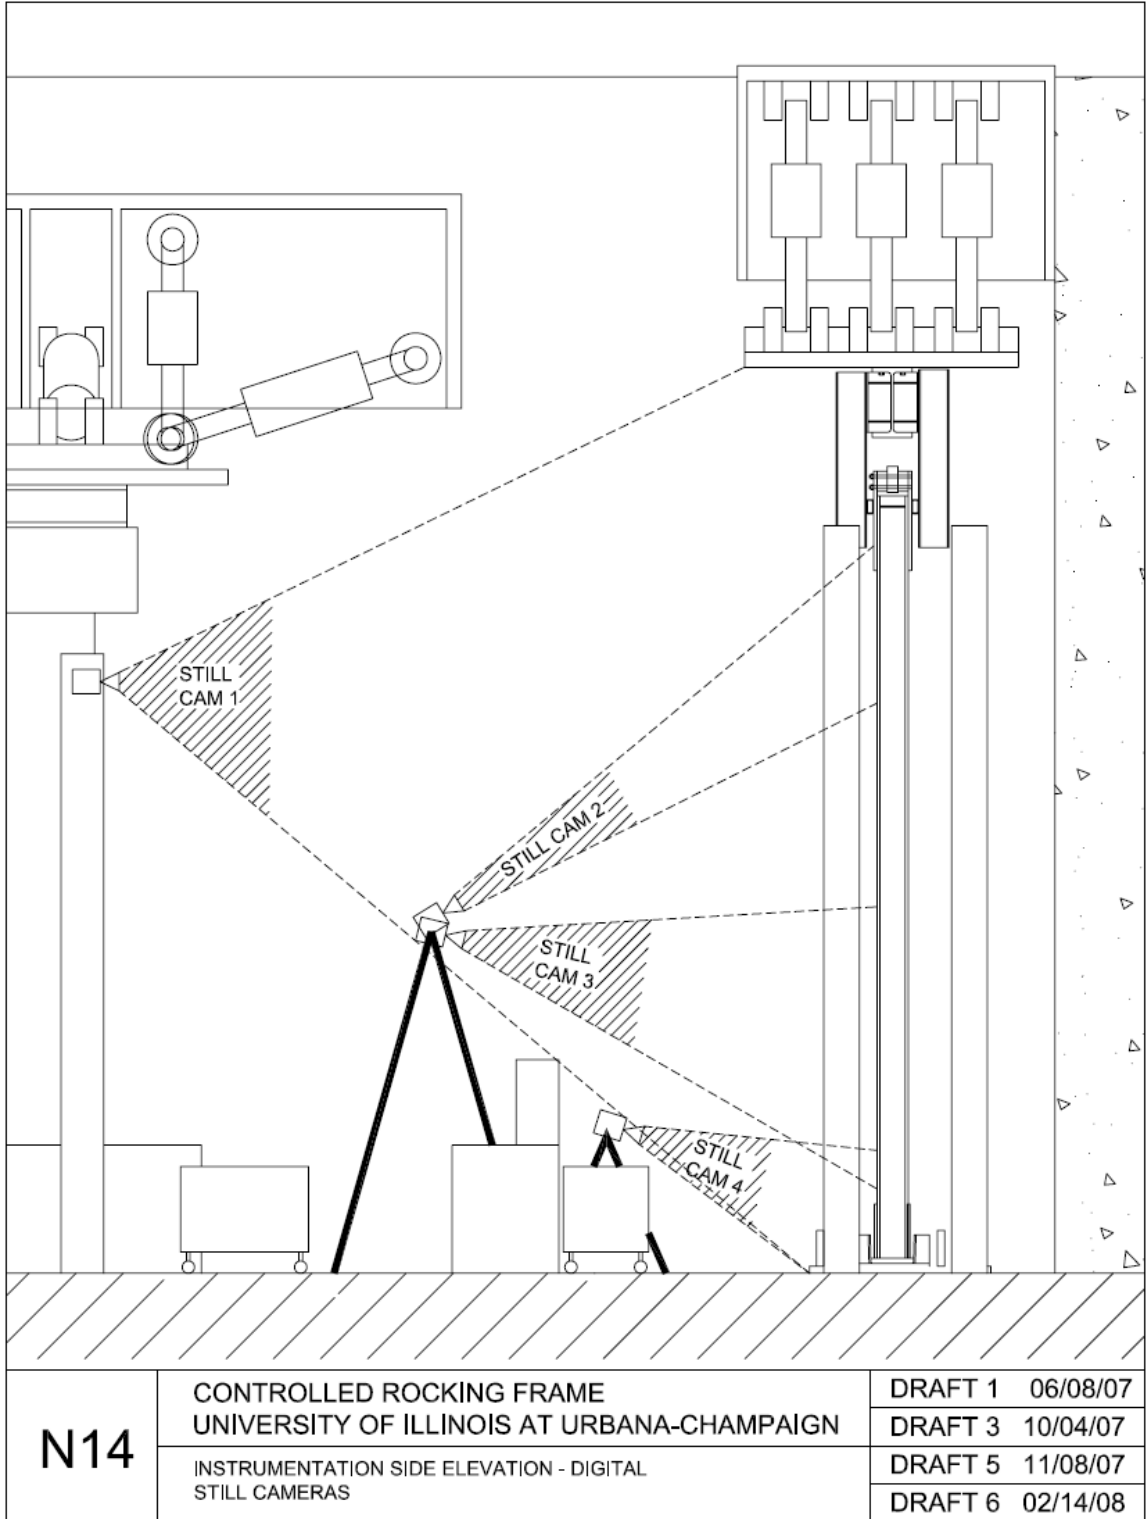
Instrumentation Plan Drawing – Digital Still Camera Location Plan
